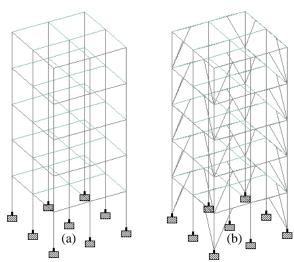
(a) Concrete Building with OMRF/SMRF, (b) Steel Building with Braced frames
